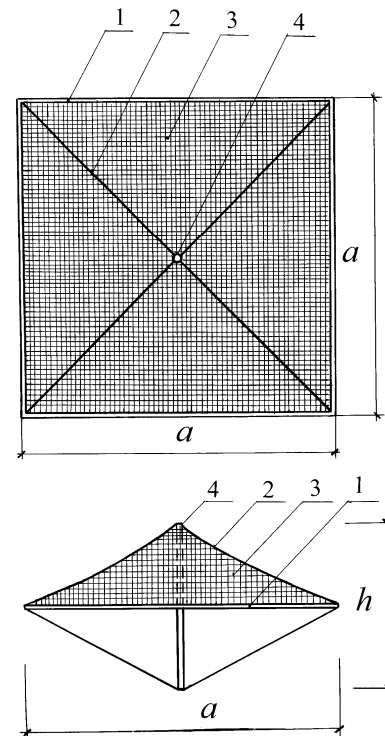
Prestressed element of cladding: 1 – cables of the net; 2 – load-bearing cable; 3 – tensioned fabric; 4 – central pillar;  $h$  – height of prestressed cladding element;  $a$  – dimension of cladding element
